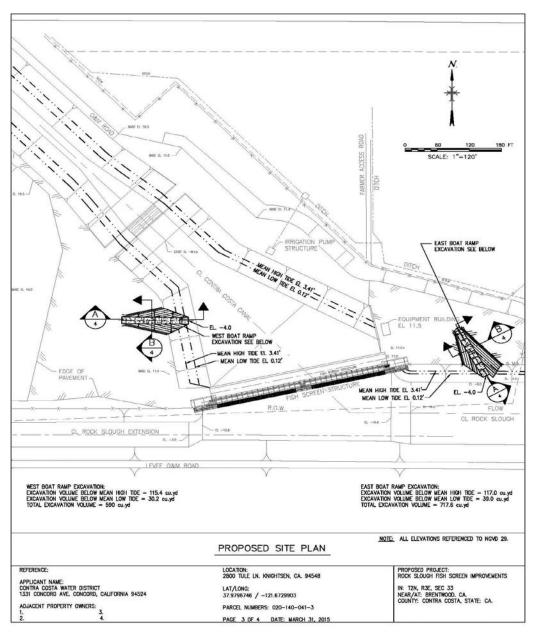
RSFS proposed boat ramp design and site plan (Reclamation 2016).
